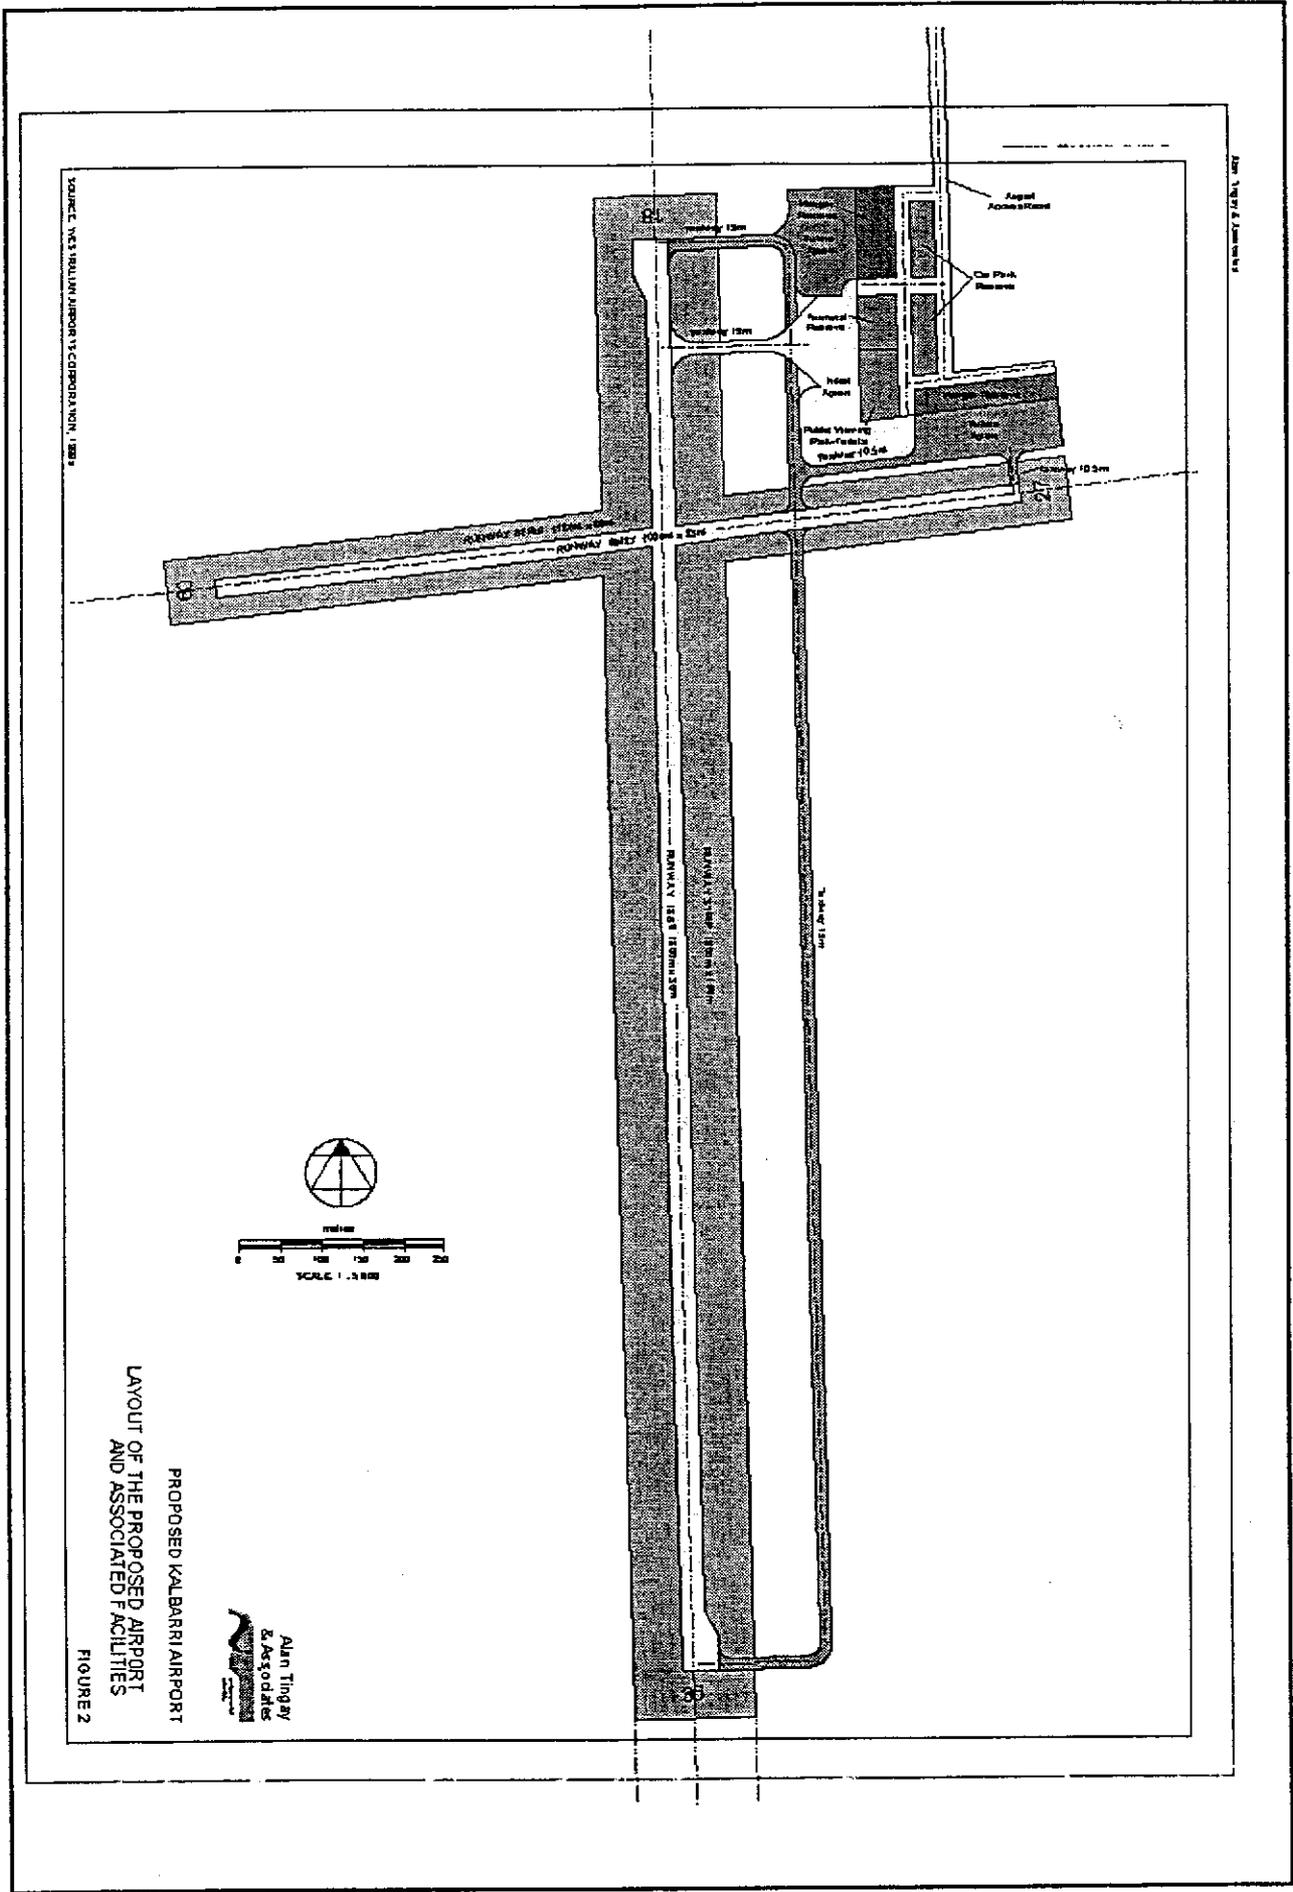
Site plan of the proposal (Source: CER, Fig.2).
